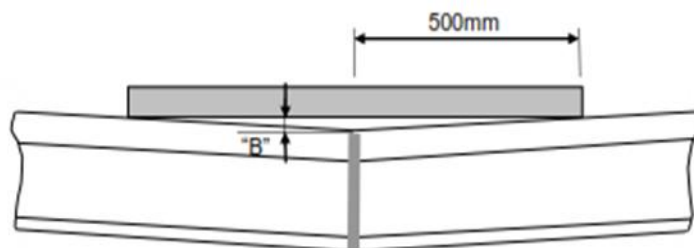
Weld misalignment tolerance in vertical plane (hollow)
